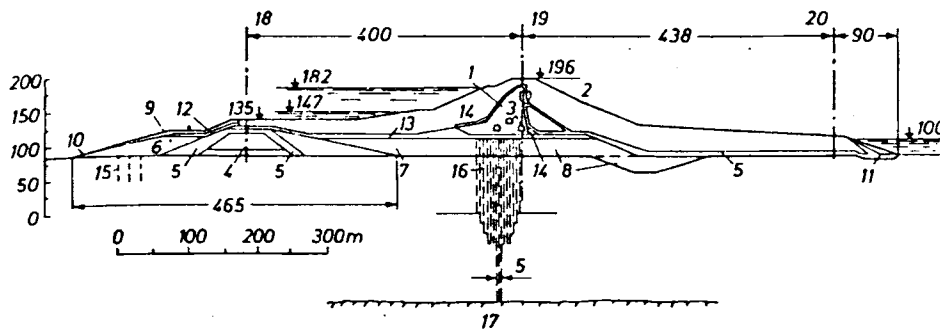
Cross section of an earth and rock filled gravity dam, Assuan power plant, Nile, Egypt, Africa (owner Egyptian state power board). Design and erection of dam by Hydro Project Moscow, USSR. Power station equipped with 12 sets of 180 MW FTs built by LMZ, Leningrad. $H = 75$ m. Only grout curtain 5) prevents seepage between rocky ground 17) and loam core 1). 2) rockfilling 3) control galleries in the loam core; 4) upstream dam; 5) grout curtain; 6) gravel; 7) compressed gravel; 8) coarse gravel; 9) rubble stone layer; 10) slurry deposit; 11) boulder; 12) clay layer; 13) compressed slurry and rubble bed layer between layers of sand and boulder; 14) soft clay; 15) sealing blanket of upper dam; 16) main sealing grout curtain; 17) rock; 18) axis of upper dam; 19) axis of main dam; 20) axis of downstream dam. From the Moscow Hydro Project.
